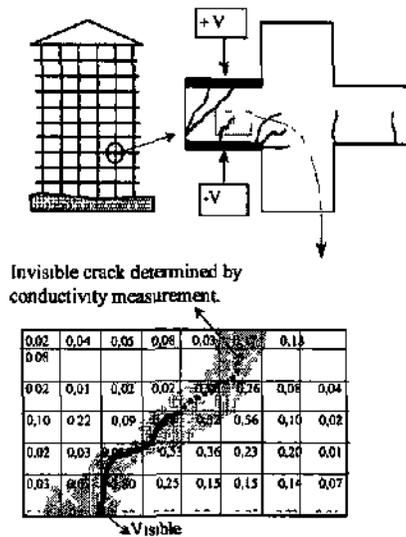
Monitoring of the cracks on concrete blocks.
